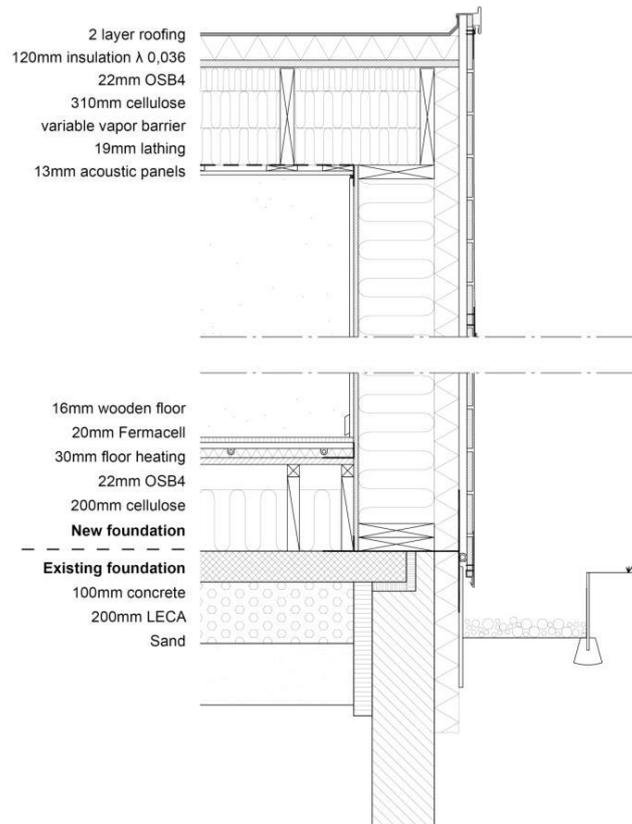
Details of roof, exterior wall, new- and existing foundation.
